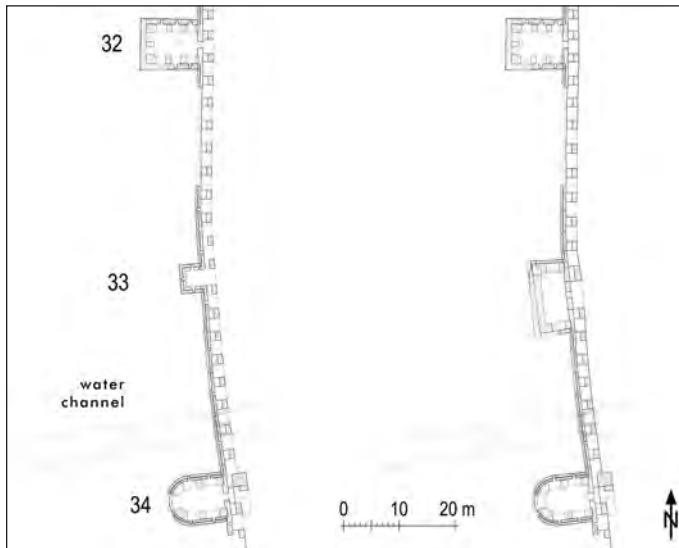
Resafa, City Wall, detail of the new survey plan, 2008. Left: tower 33 as a small tower as originally planned. Right: Tower 33 as a larger tower in an unusually elongated form, Catharine Hof 2008.
